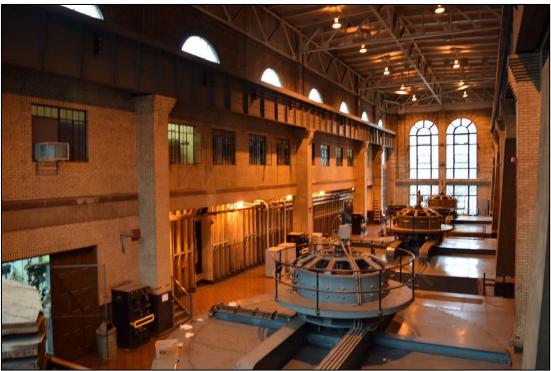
Bellows Falls Project, interior of Powerhouse generator hall.
